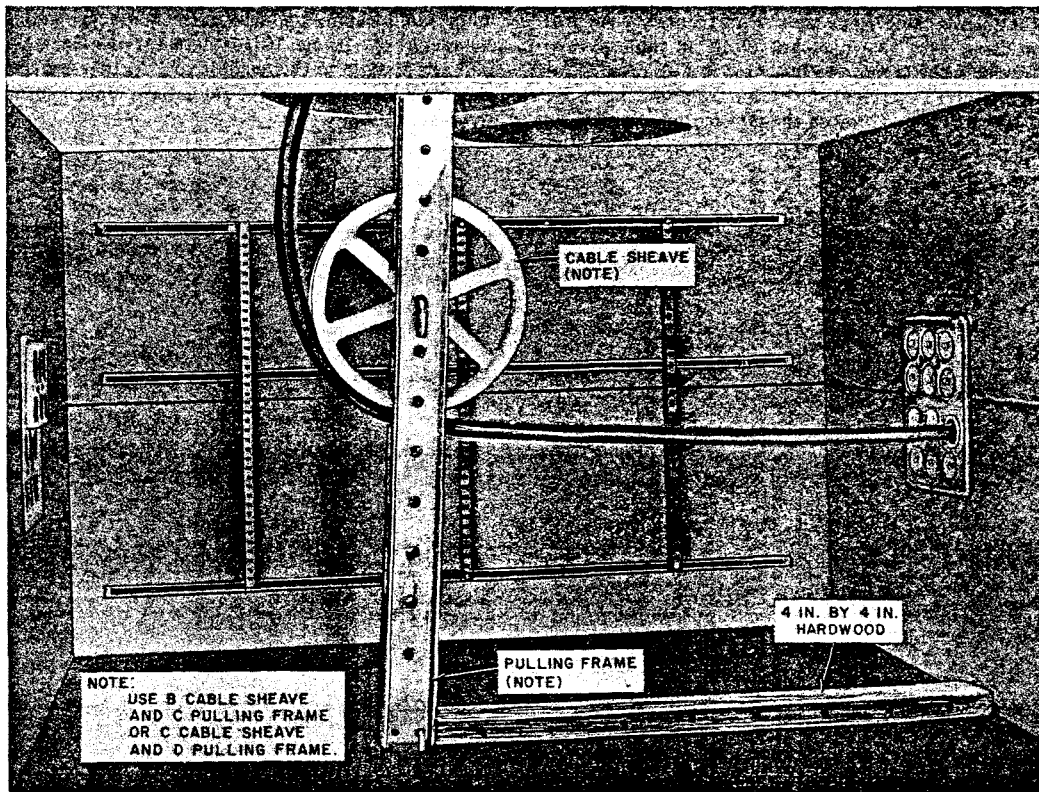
View of Manhole Showing Pulling Frame and Cable Sheave Arrangement
